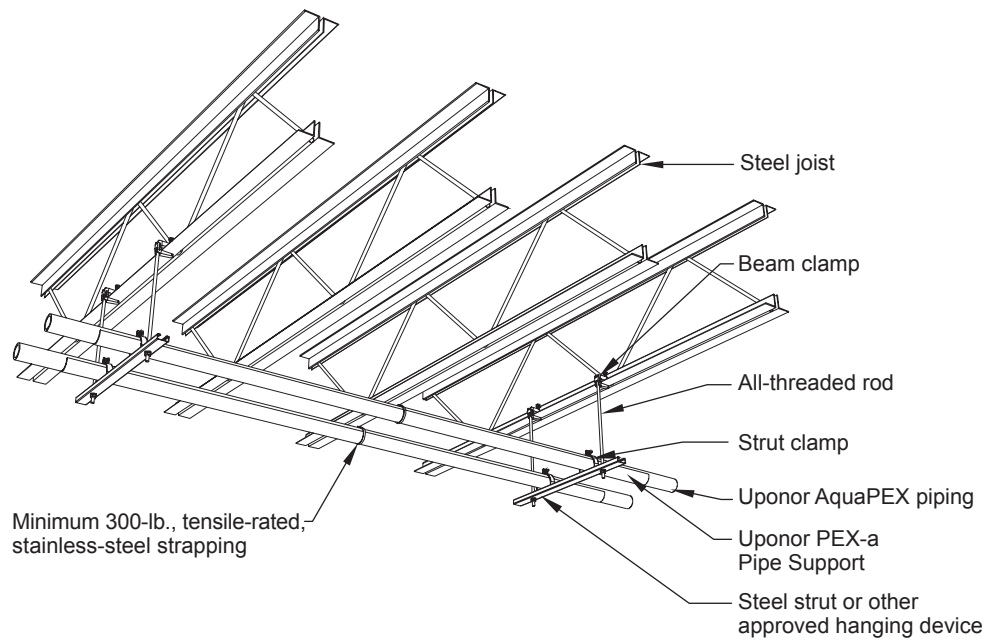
Uponor PEX Suspended from Steel Joists with Strut and Uponor PEX-a Pipe Support
